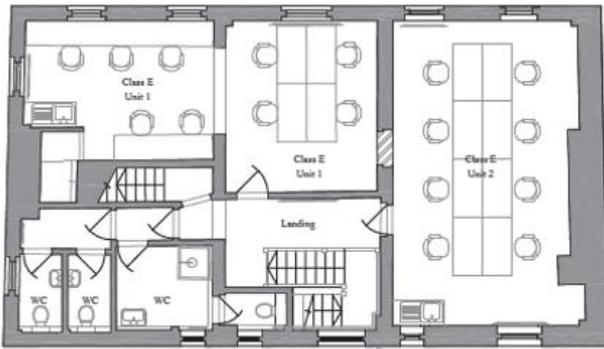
Option 1 - Proposed First and Second Floor (Class E)
